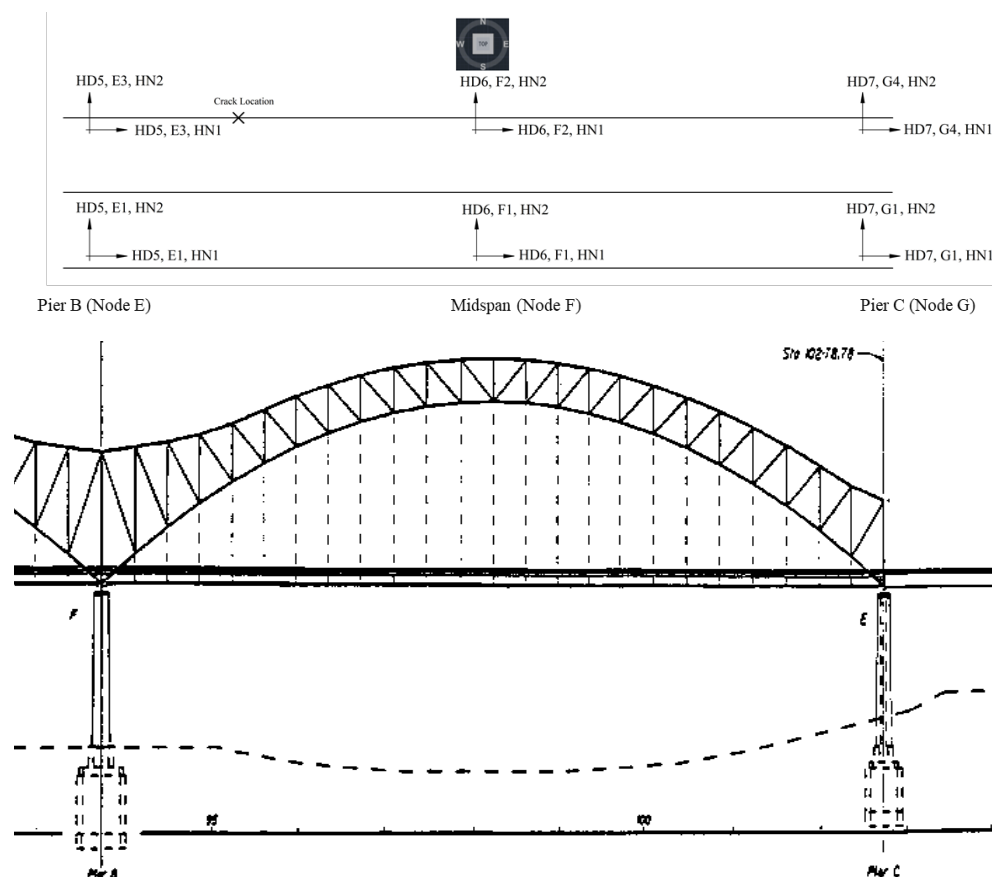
Location and designation of sensors on the span of the I-40 Bridge with the cracked beam.
